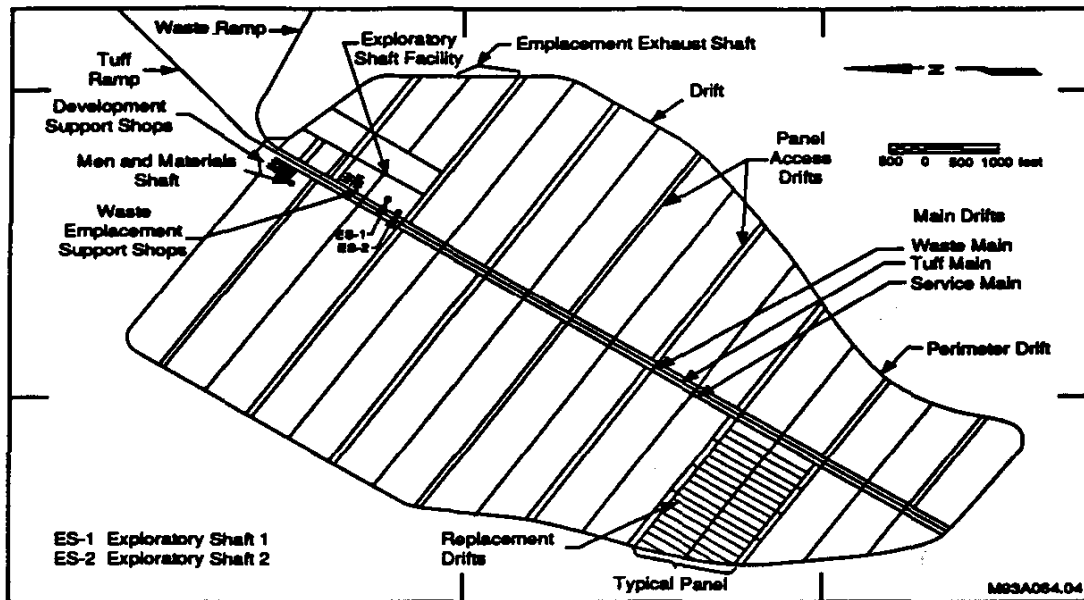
Underground Repository Layout for Vertical Waste Emplacement¹
